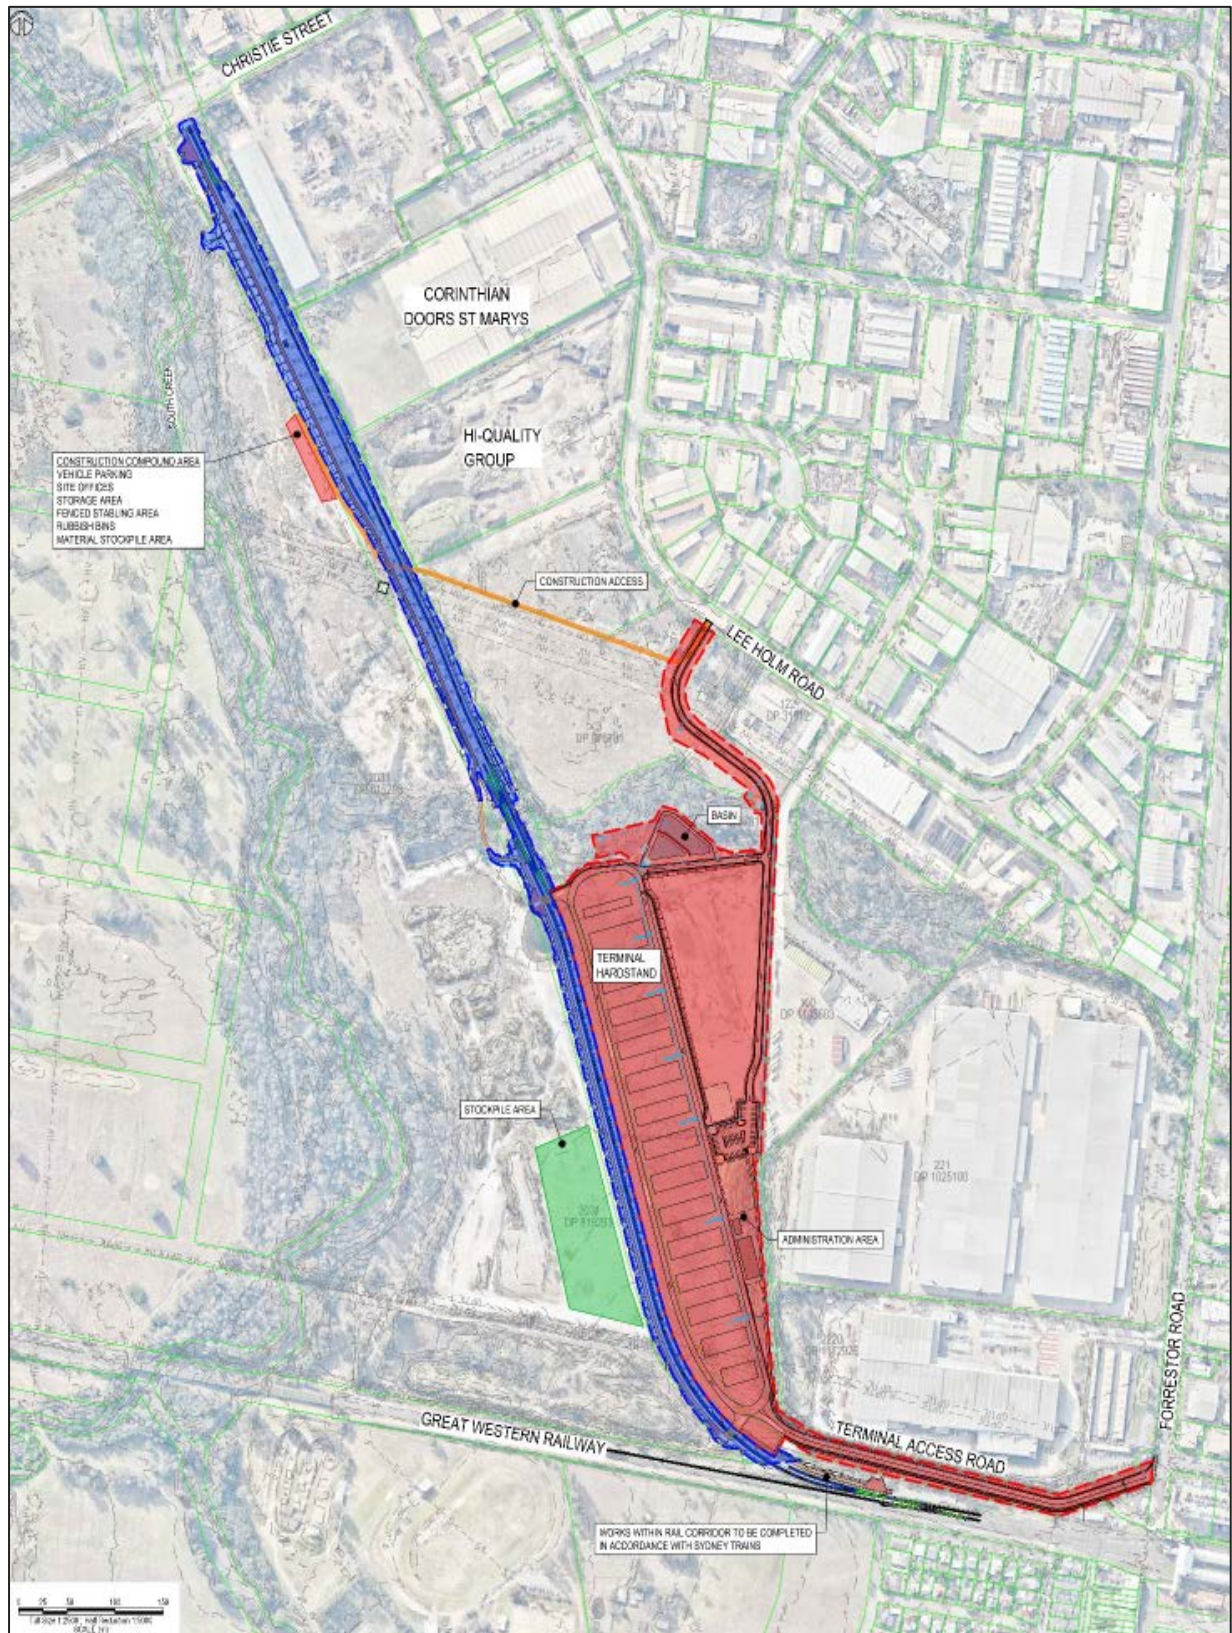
| Proposed development layout (source: Applicant's Modification Report)
